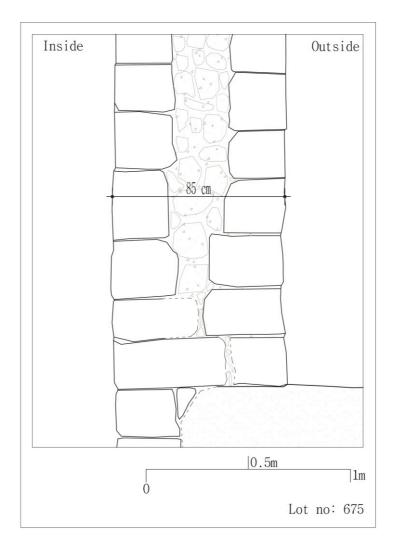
37 Double sided walls infill with 'sillez' - Supporter wall of vault
